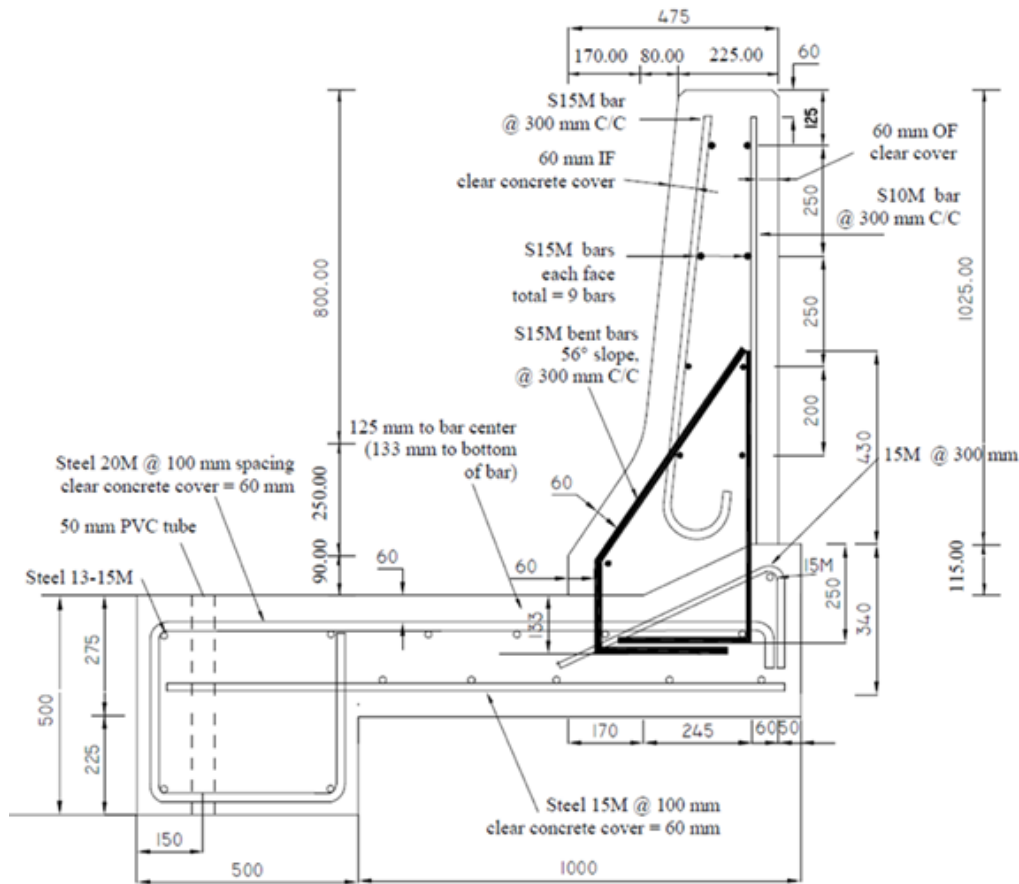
Cross-section of barrier specimen with deck slab cantilever
